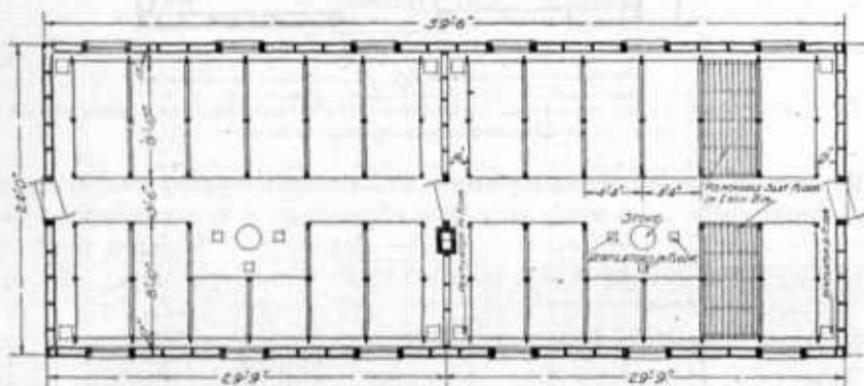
Floor plan of a 24 by 60 foot sweet-potato storage house having a capacity of about 5,200 bushels.
